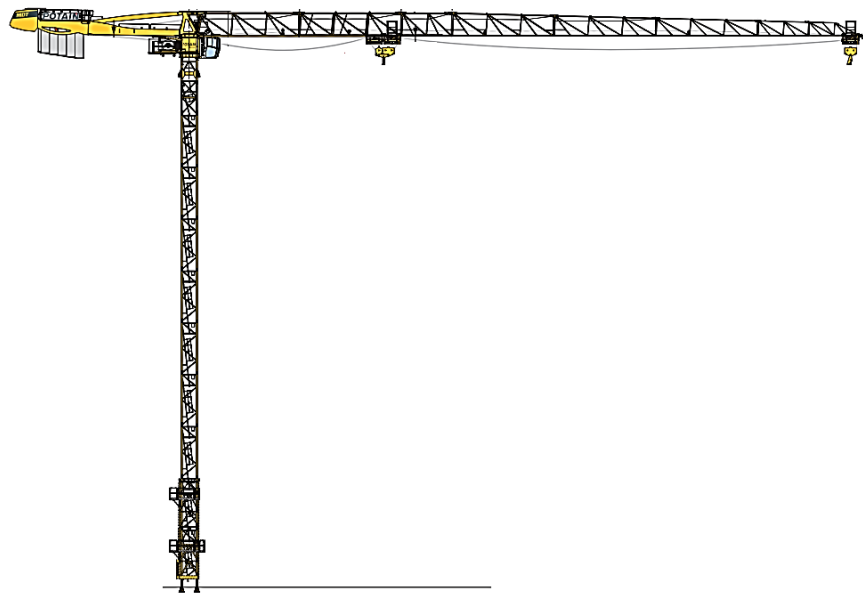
Topless hammerhead tower crane (www.nftcrane.com)
